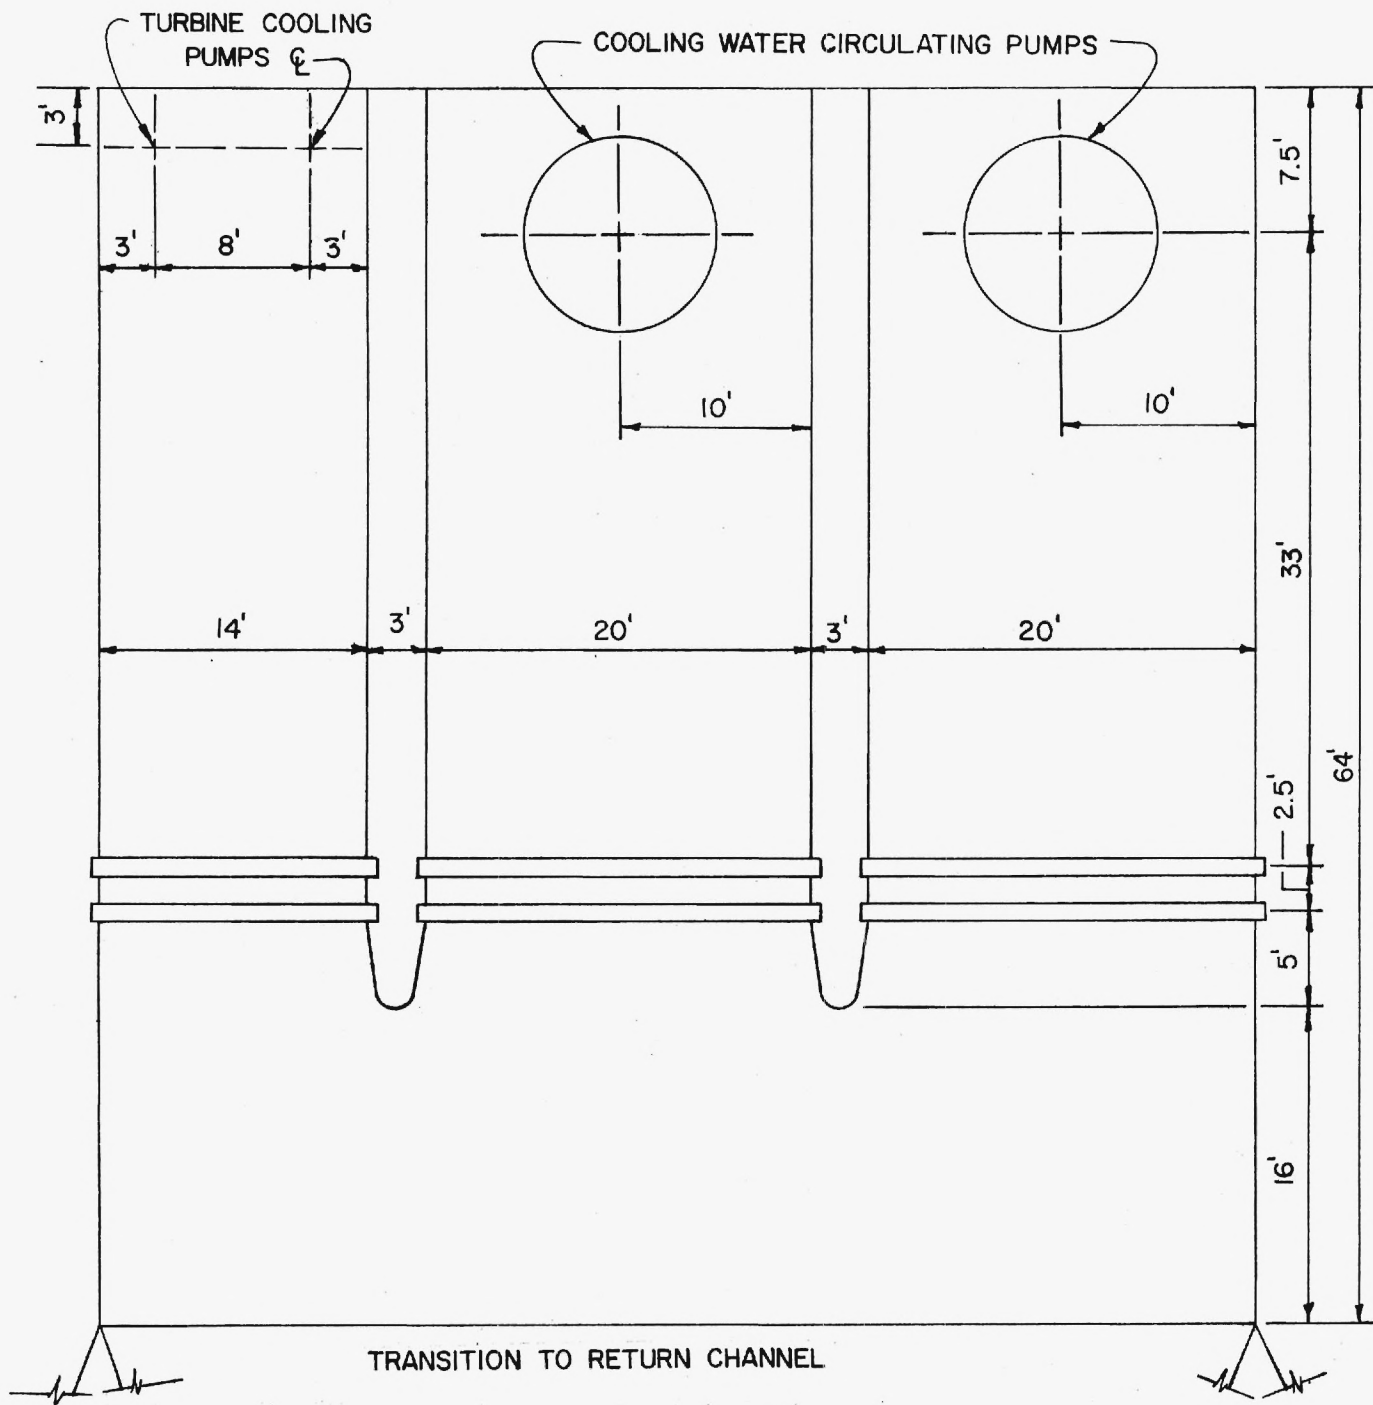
PLAN VIEW OF PUMP INTAKE STRUCTURE,
